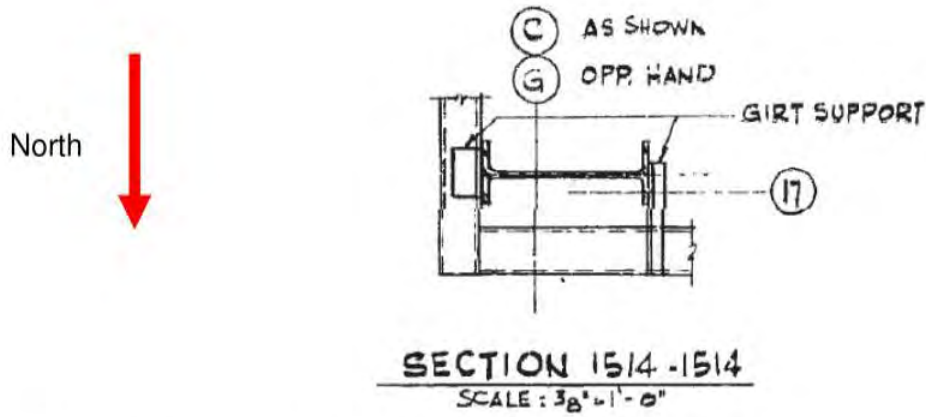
Drawing of North Wall Girt Connection at Column Lines C&G [7c]
